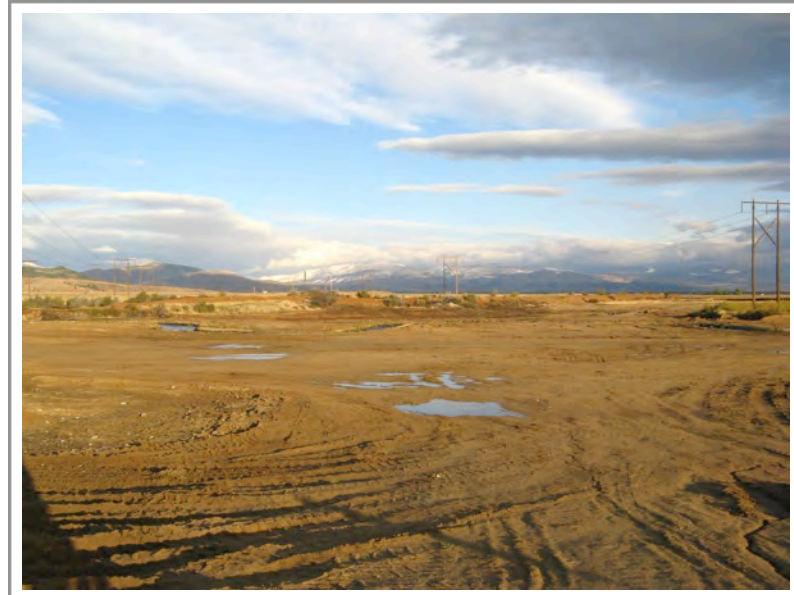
Upper section of Subarea 4—recently excavated soil and newly reconstructed stream channel in the background
